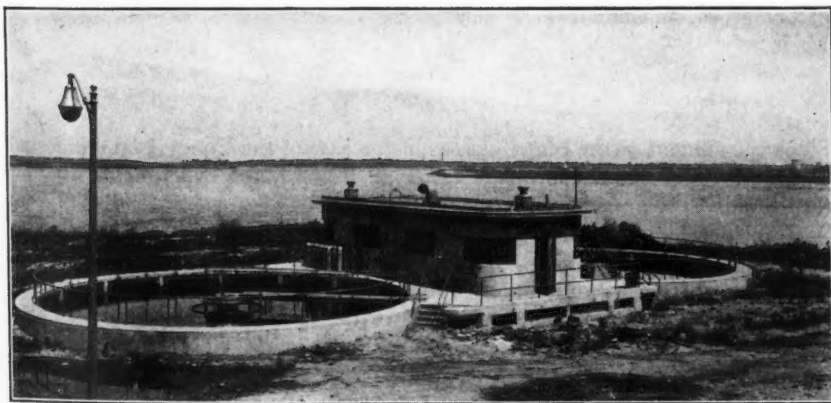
BOWERY BAY SLUDGE THICKENING INSTALLATION
